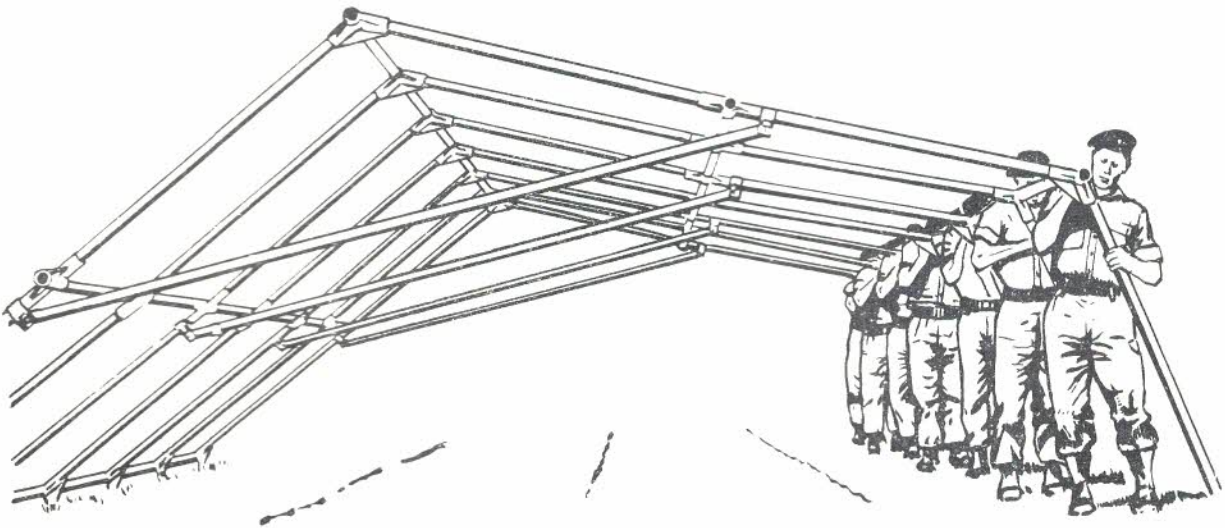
FITTING UPPER WALL SUPPORTS TO EAVE LINE
